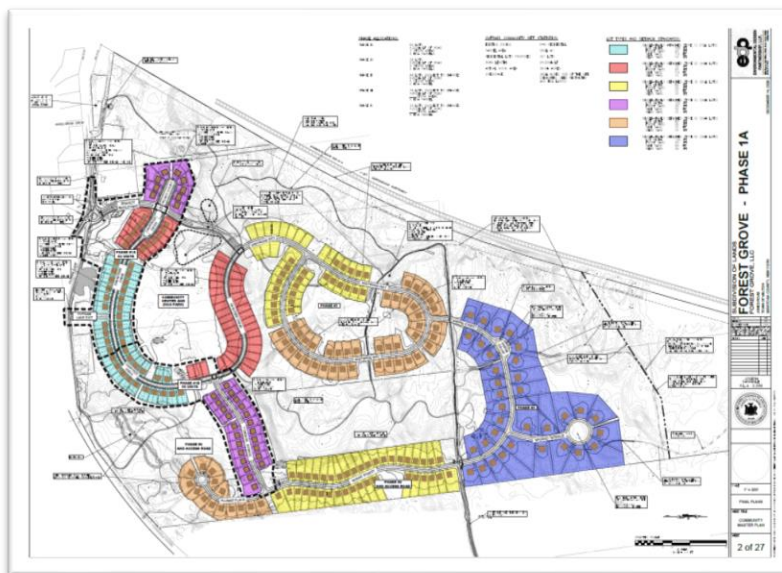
Subdivision plan for Forest Grove 321-Lot Conservation Subdivision
